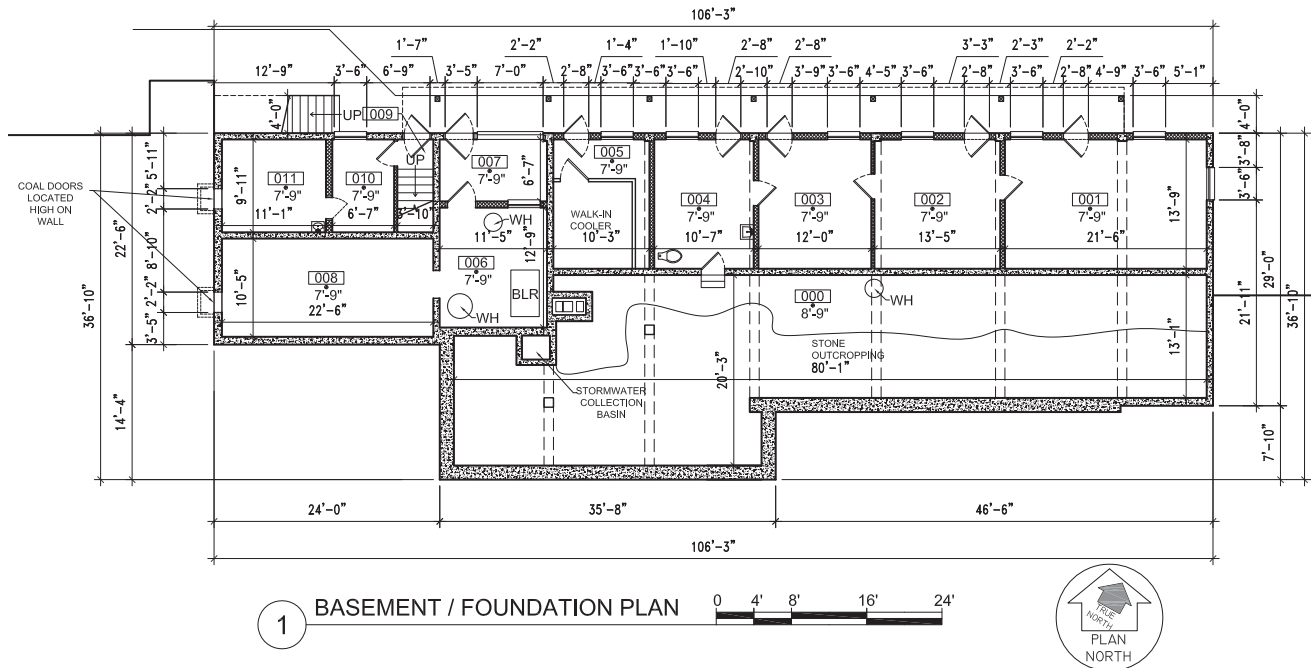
Basement level plan. A larger version of this plan can be found in *Appendix B*.
